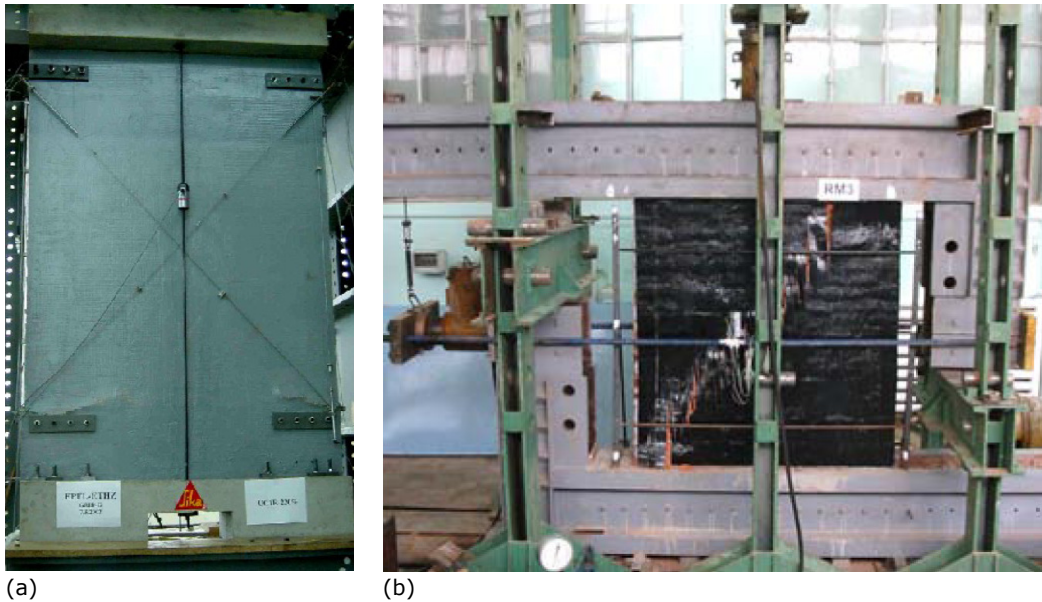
FRP bidirectional laminates. (a) rocking failure with rupture of FRP [28]; shear failure of wall strengthened with FRP fabric with vertical fibers [166]
